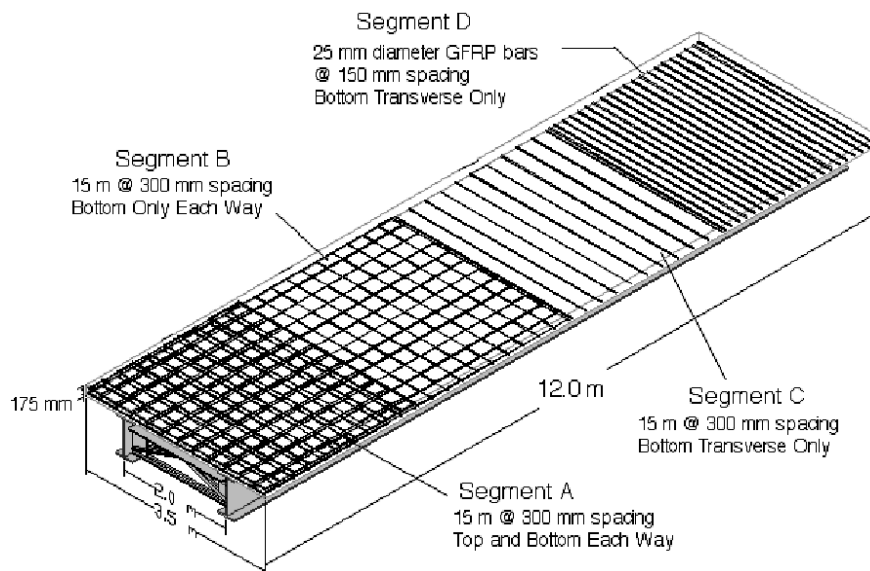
Full-scale bridge-deck panel (Khanna et al. 2000)
